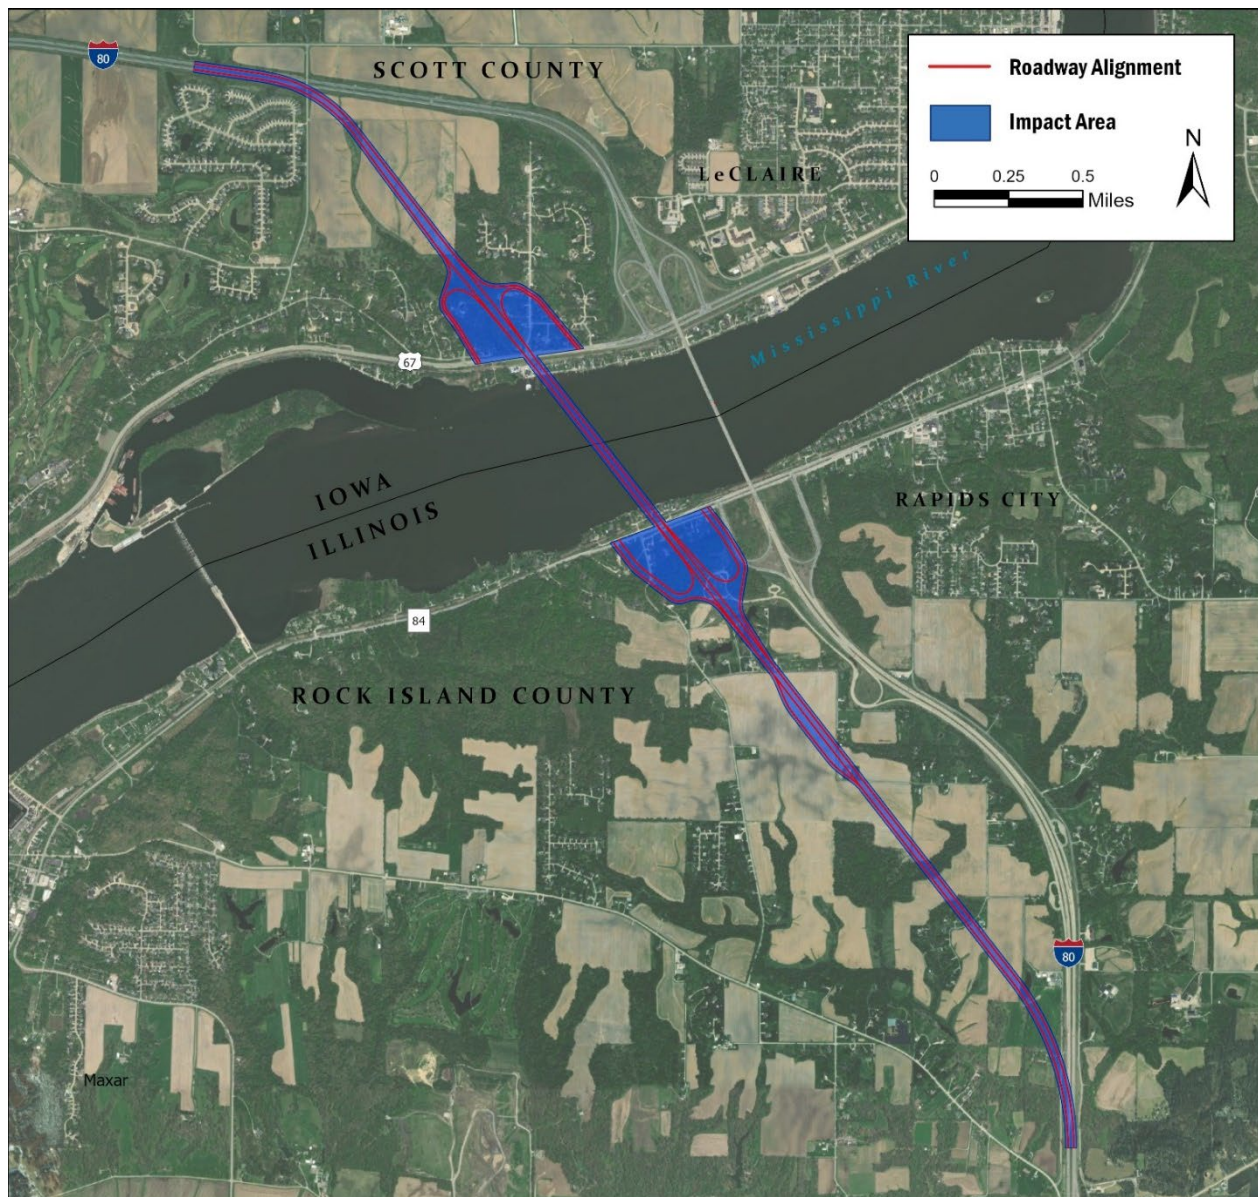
ALTERNATIVE 6 – BRIDGE REPLACEMENT ON NEW ALIGNMENT EAST
